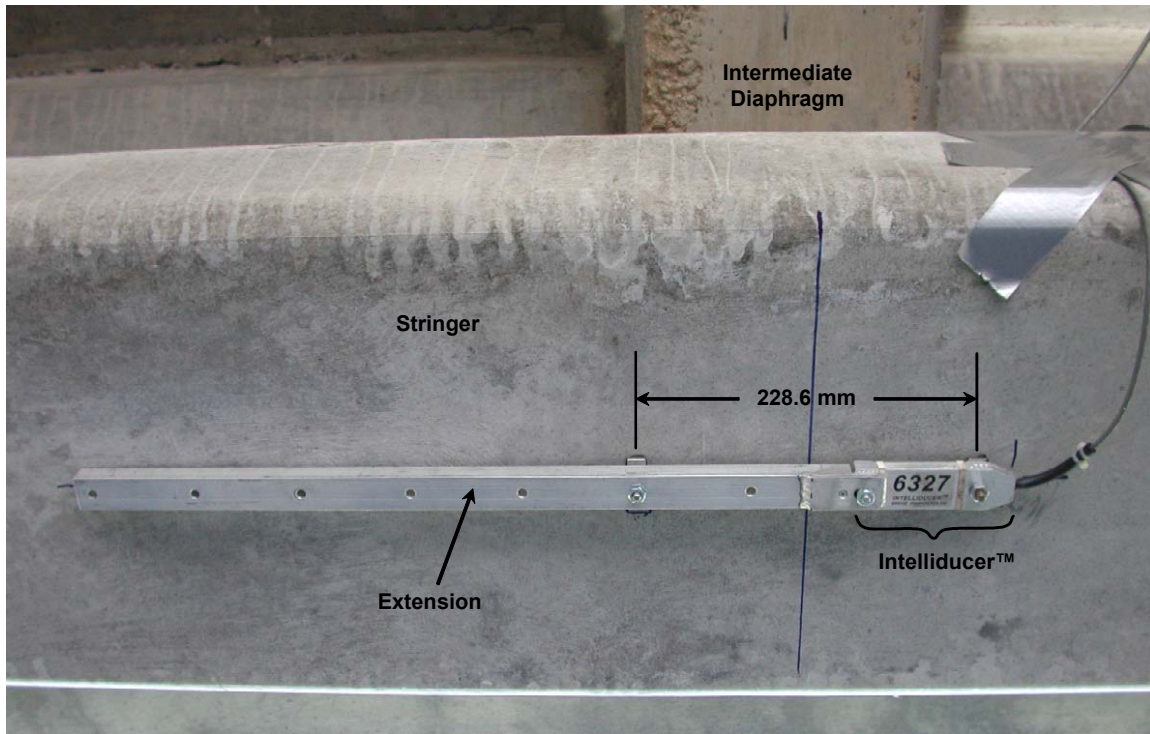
Intelliducer™ Mounted to Bottom of Concrete Girder with Extensions
